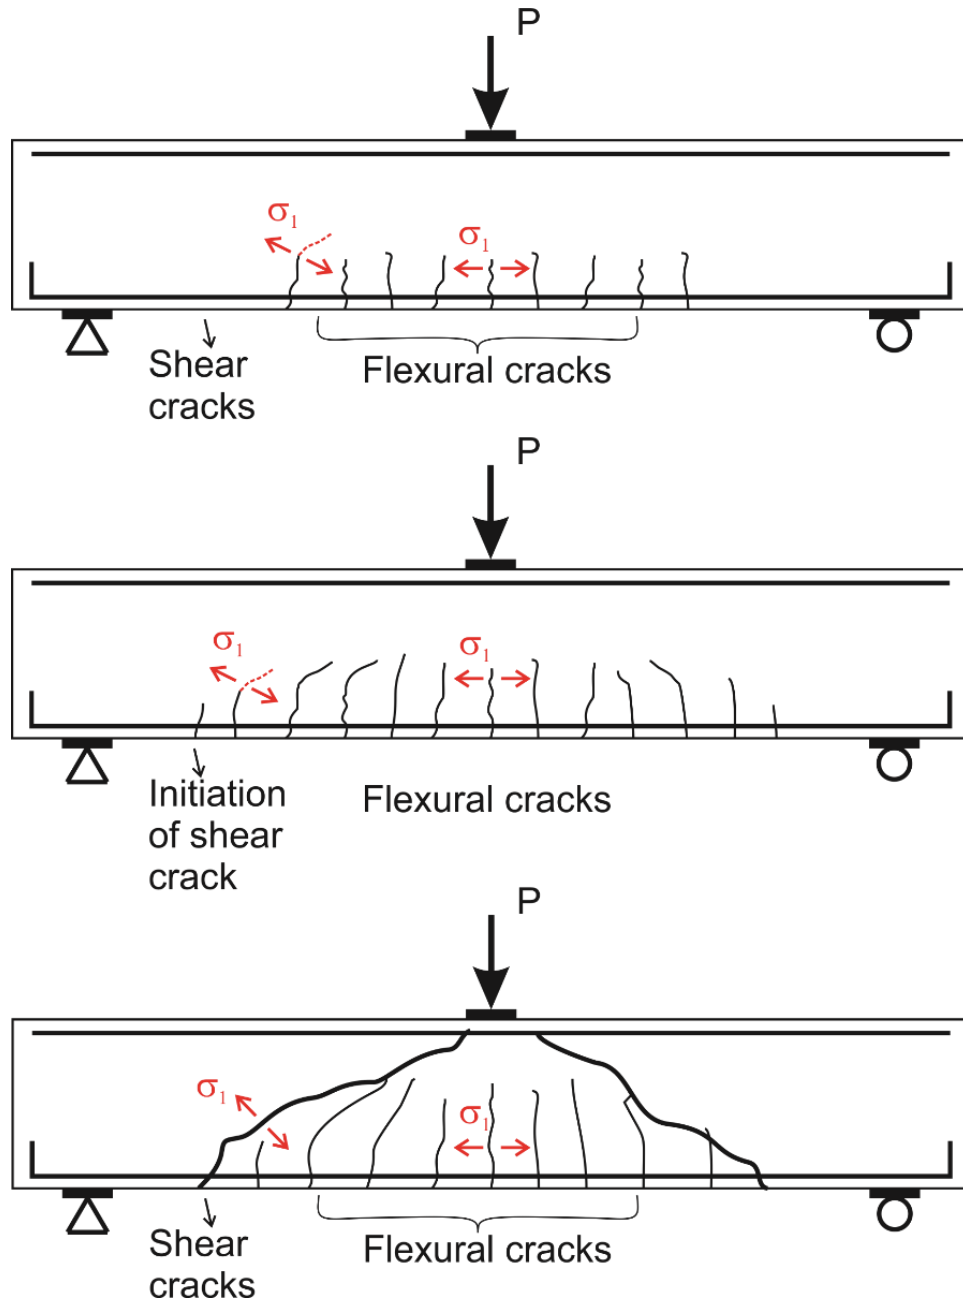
Development of Flexural and Shear Cracks in a RC Beam Dominated by Shear Failure.
